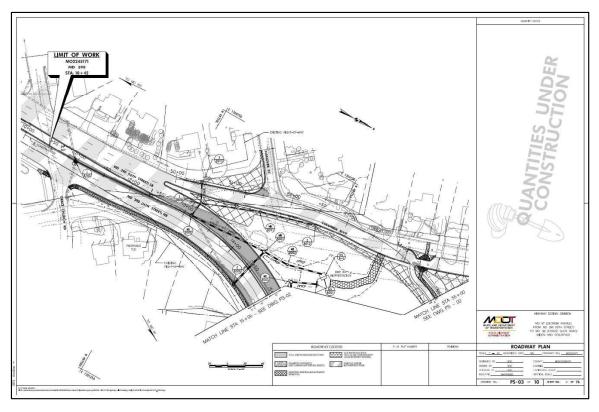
Plan View -16^{th} Street South to Grace Church Road
